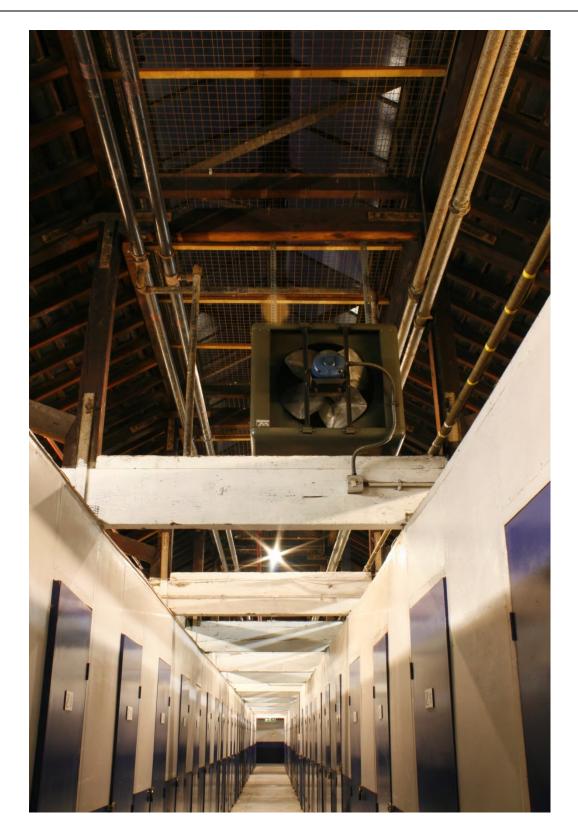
First floor access corridor along storage area on the north side of the building, showing original Queen truss, looking north-east (72FmLa D100 059)
